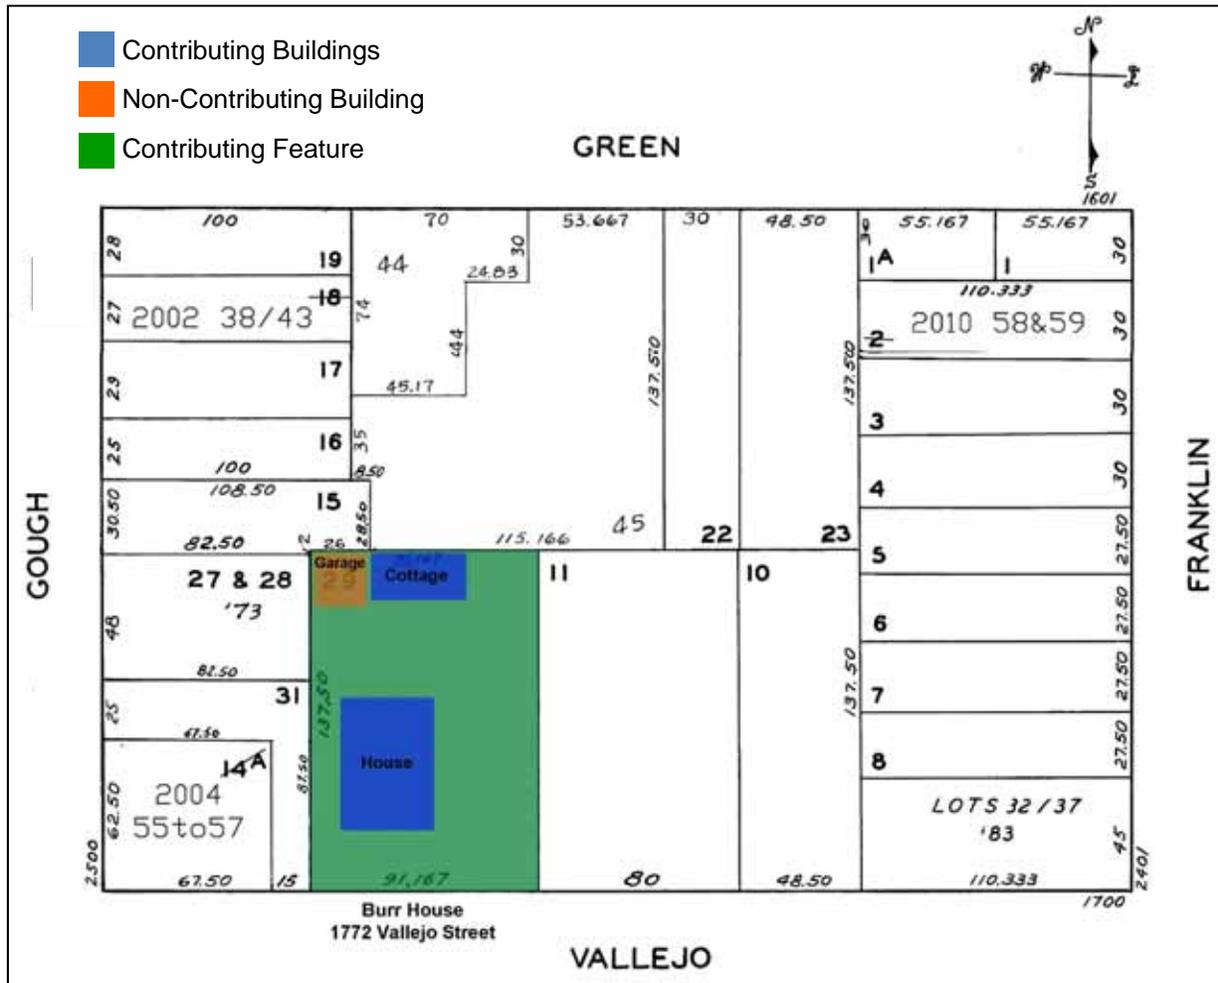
Current site plan. The house and cottage are contributing buildings and are shaded blue; the garage is a non-contributing building and is shaded orange; the garden setting is a contributing feature and is shaded green.
